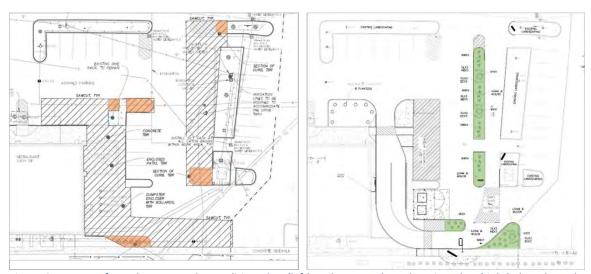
Excerpts from the proposed Demolition Plan (left) and proposed Landscaping Plan (right) that show the landscaping areas that are proposed to be removed in orange, and the landscaping areas that are proposed to be added in green.
